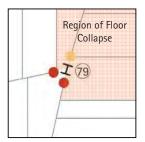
Remaining bracing configuration for Column 79 following floor failure (red = welded double-angle knife connections which are weak in tension)
